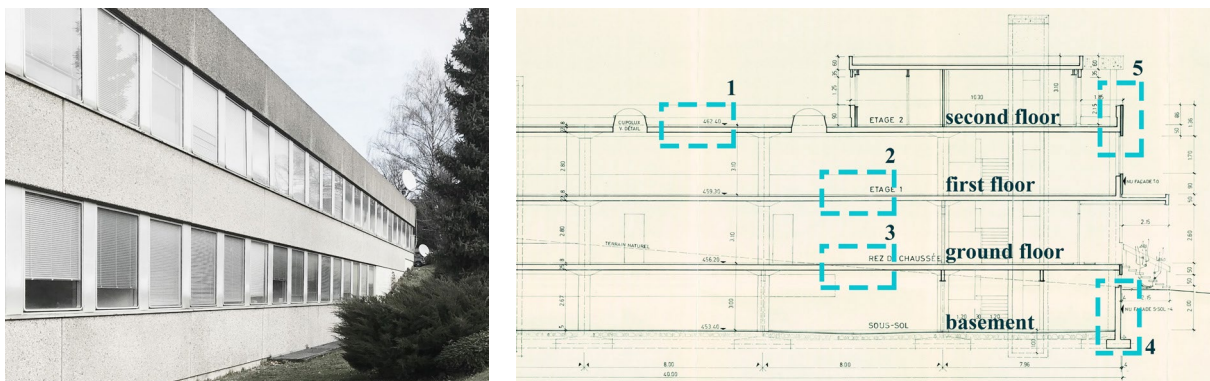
Donor structure and possible locations for the extraction of concrete blocks
